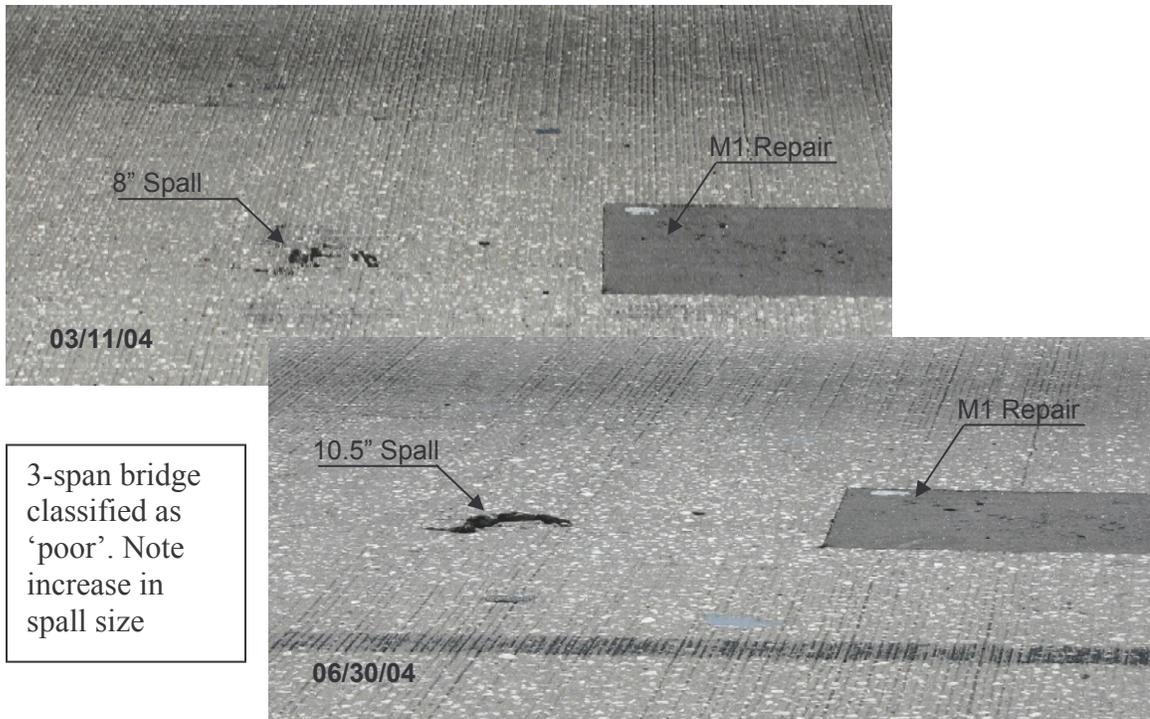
I-75 SB over Woodberry Road, Span 1 (Bridge #100470)
